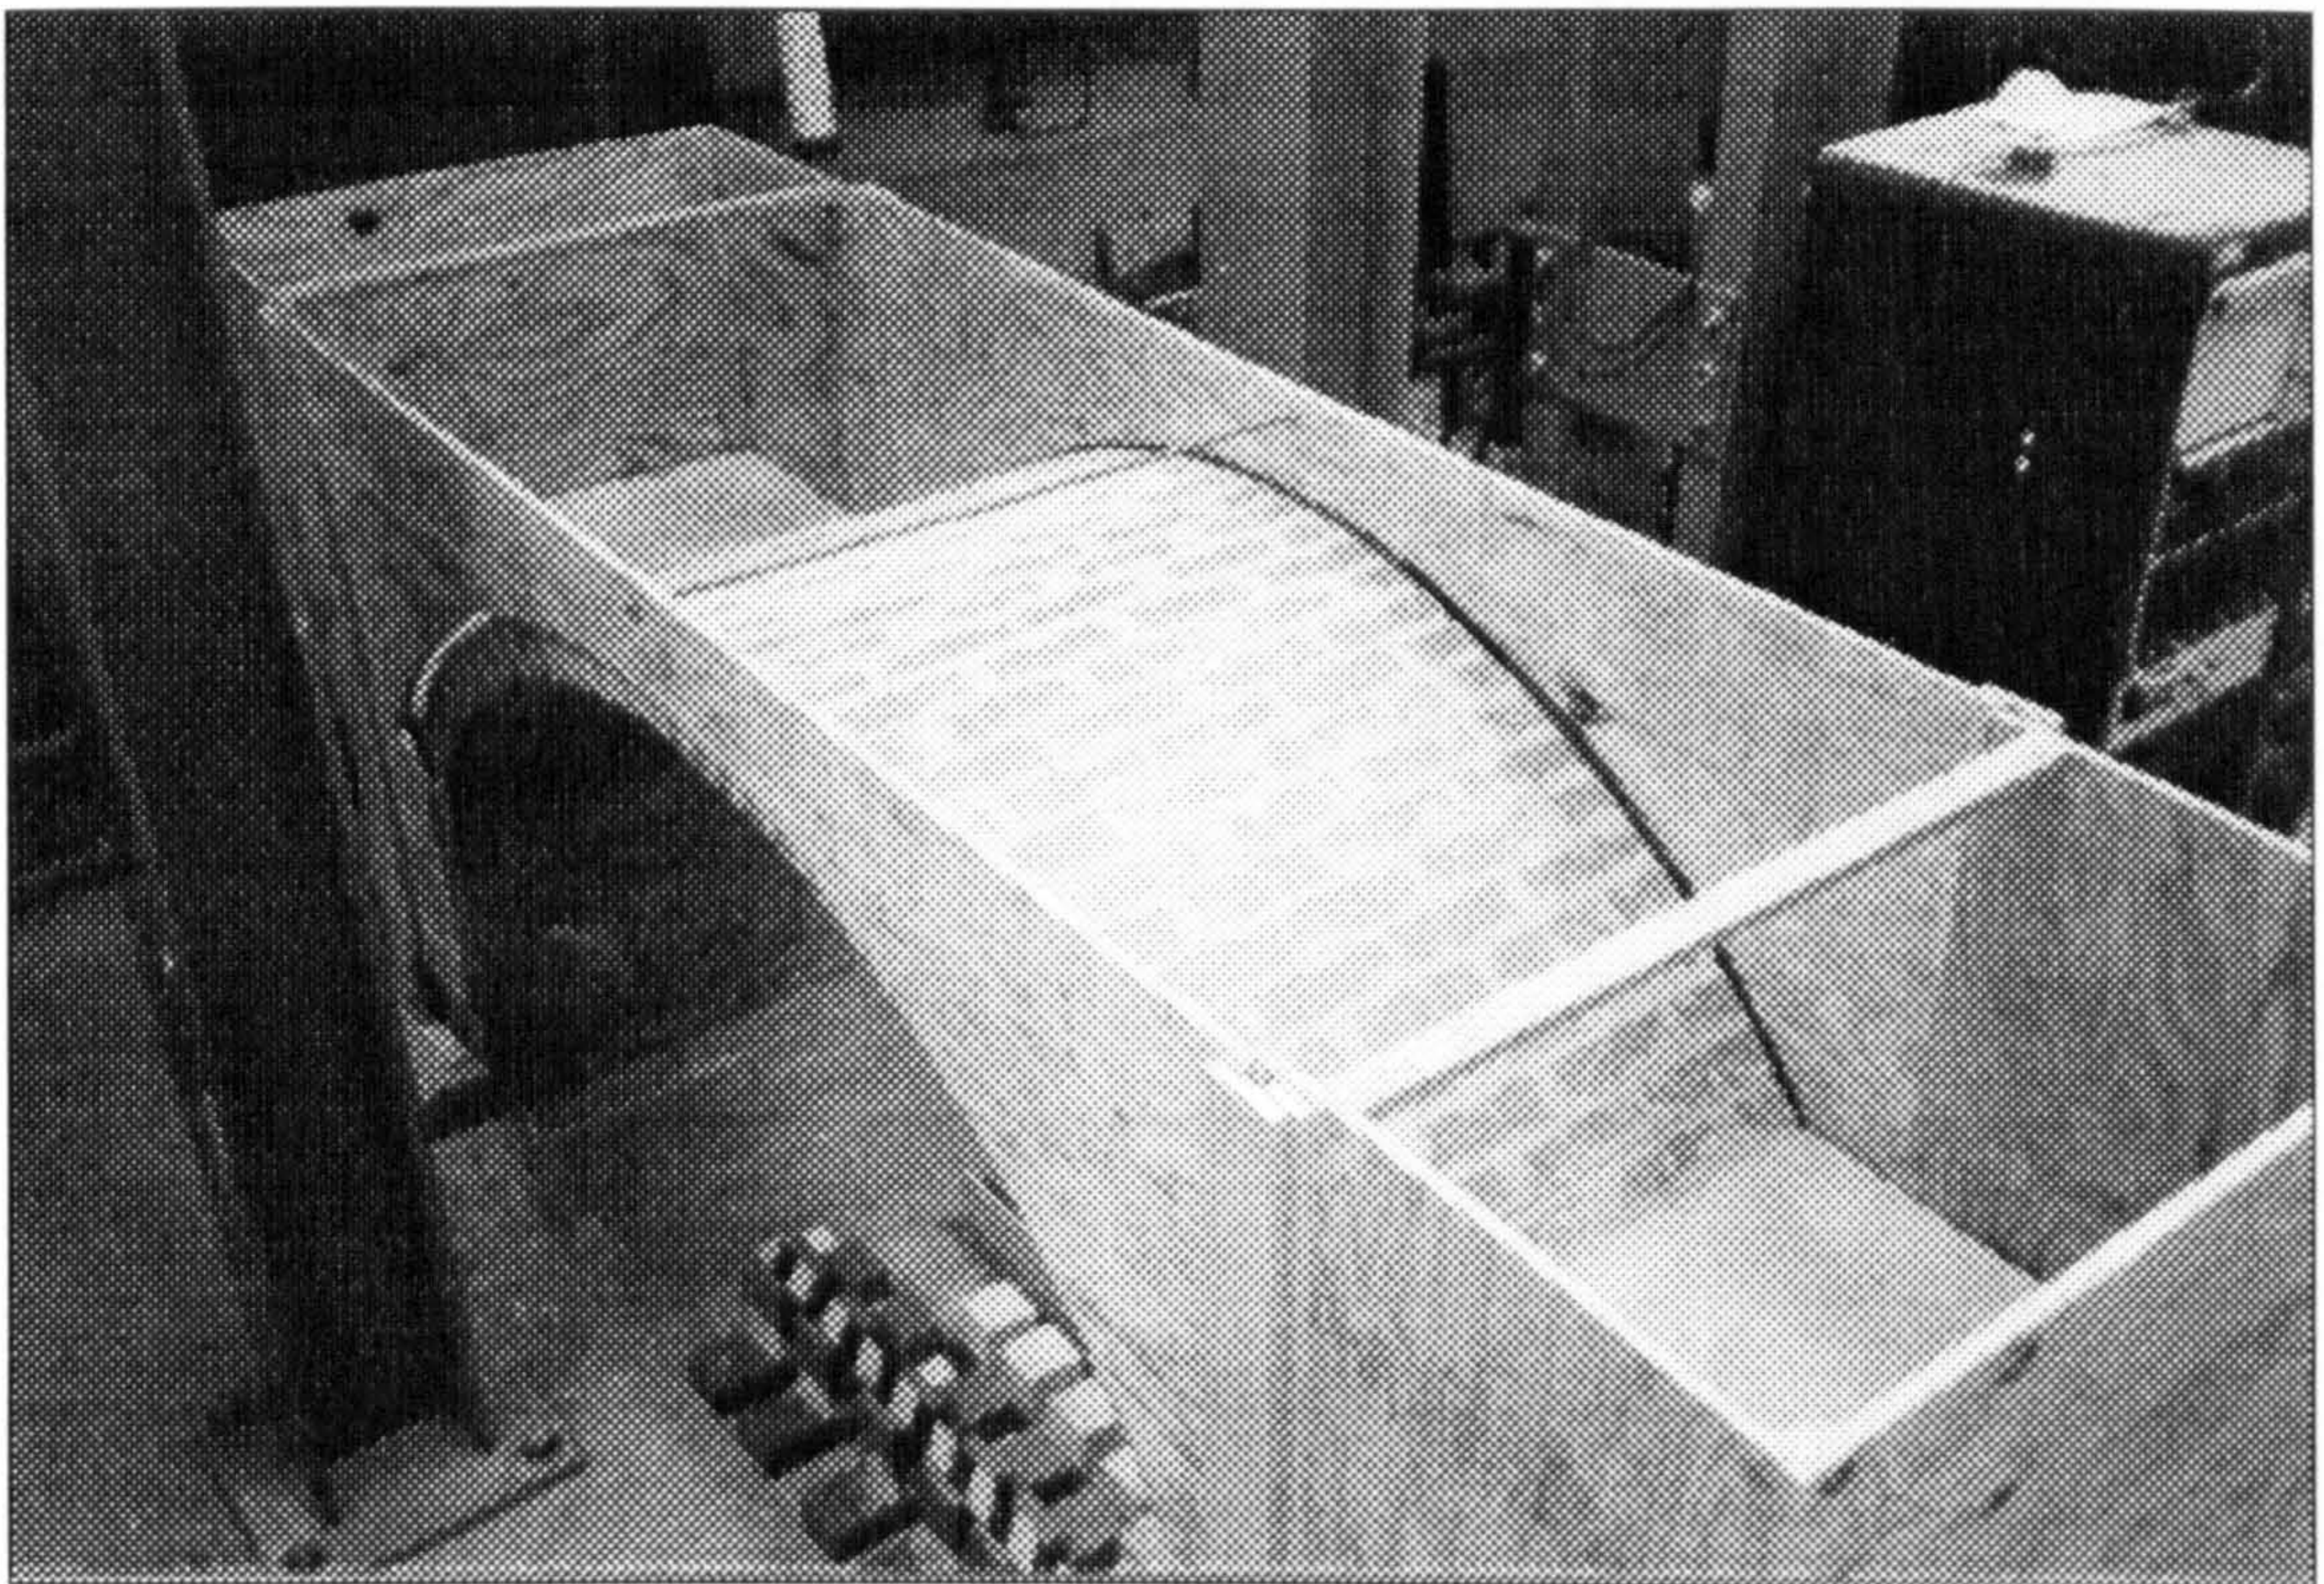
A bare arch with timber spandrel, wing and end walls
